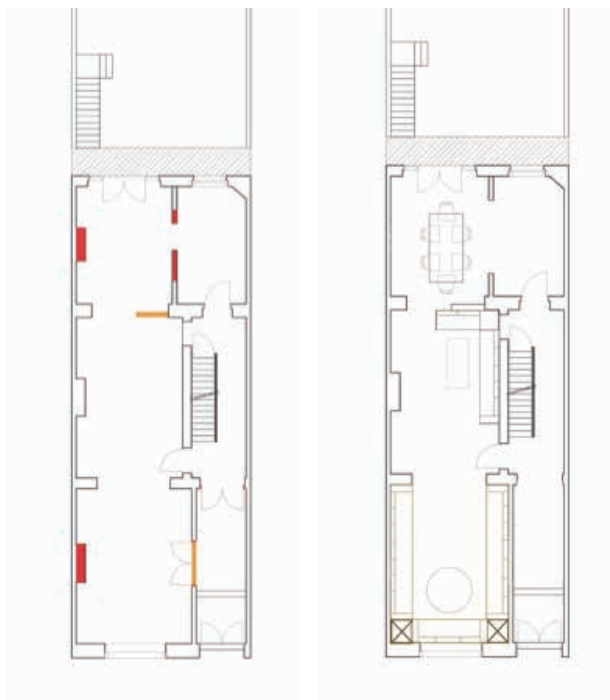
Left : original ground floor plan, showing, in red, the demolished parts, and in yellow, the built ones, Right : Architectural modifications and the final adopted layouts.
